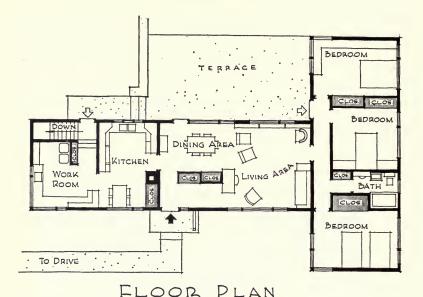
Sketch plan of basic farmhouse also illustrated as a "working drawing" in Figures 16 and 17. Plan is adaptable for different facings on a public road.
